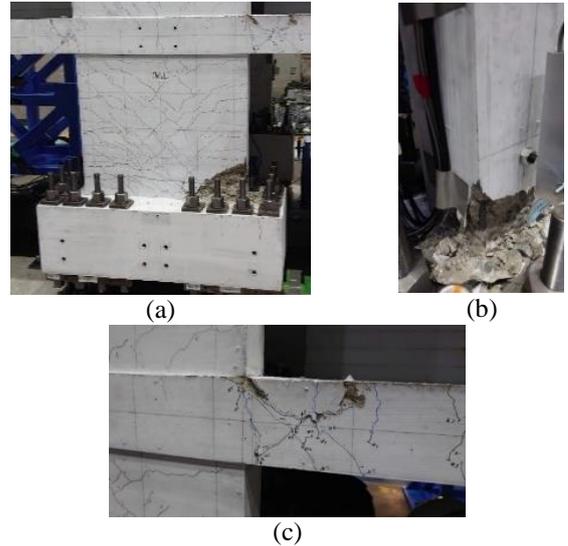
Damage states after Run 5 of (a) CW2 wall; (b) C1 column and (c) G2 beam.
